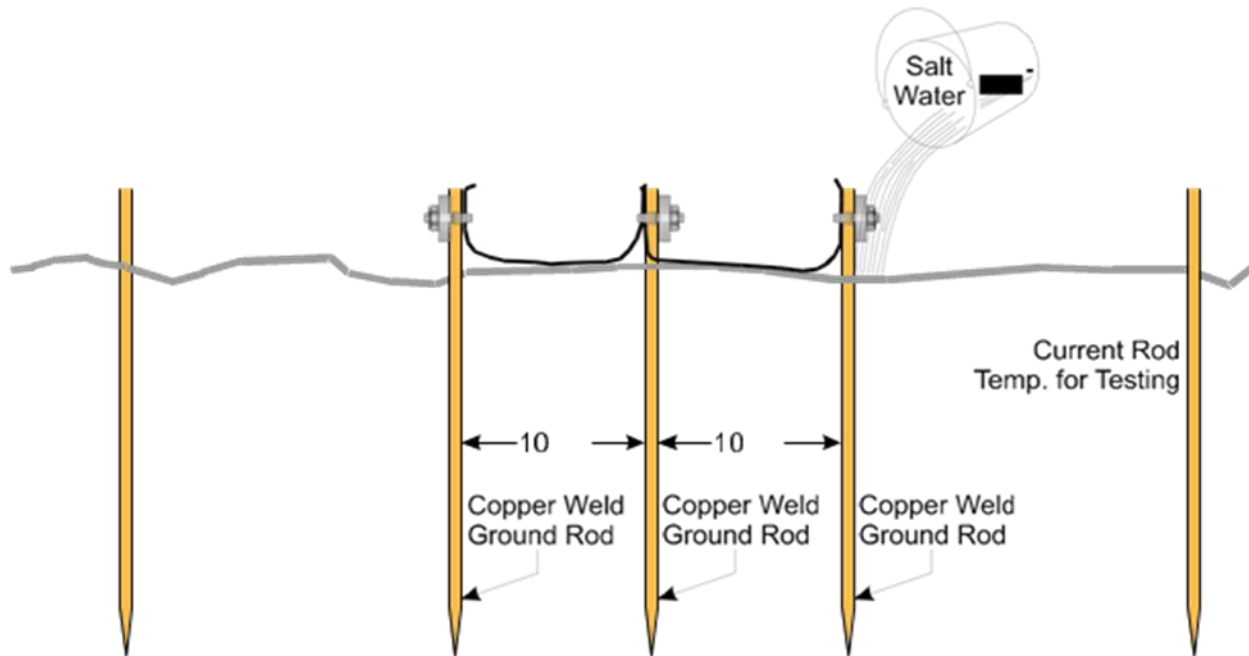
Basic Ground Bed Soil Test Setup with Additional Ground Rods
